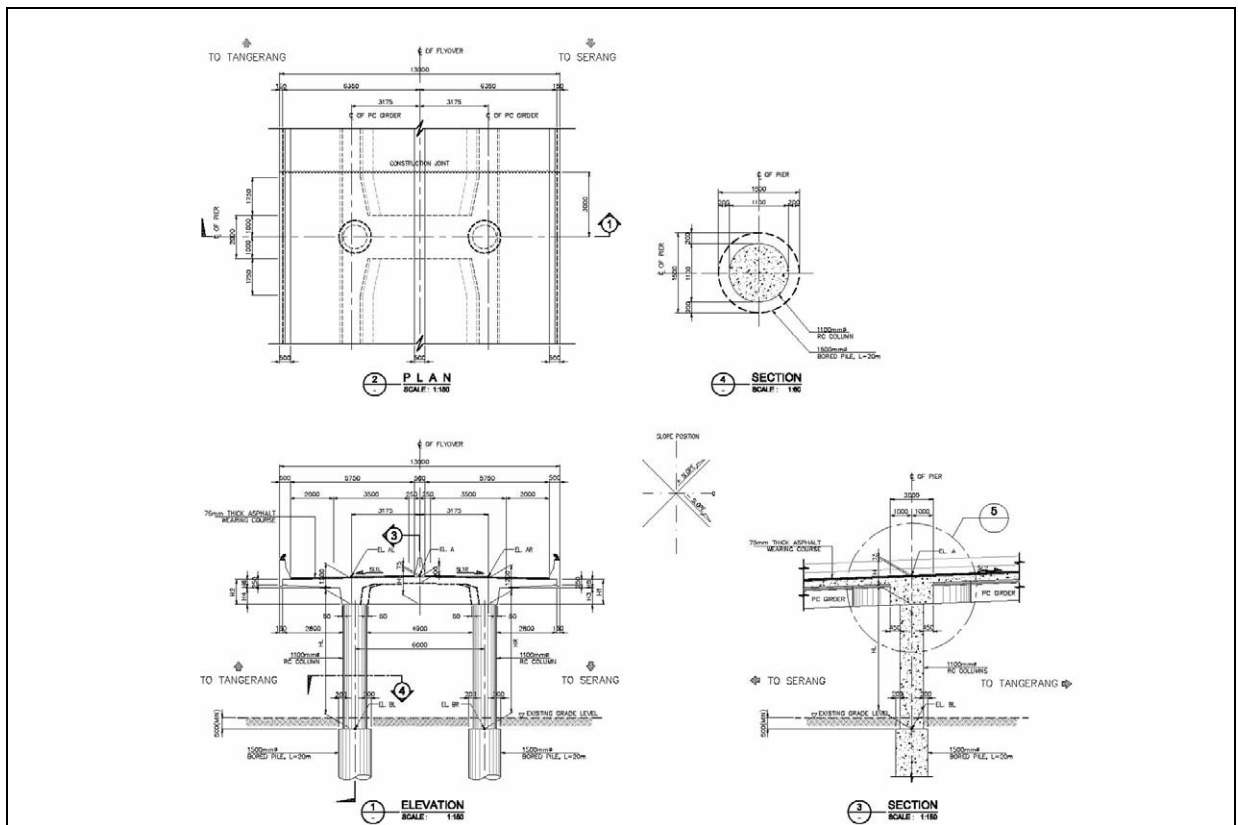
TYPICAL TWO COLUMN PIER
